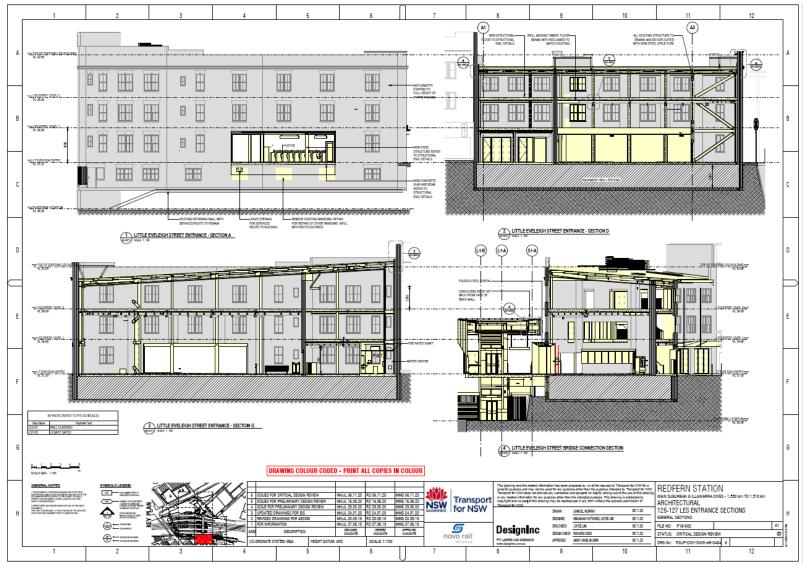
General Sections – Little Eveleigh Street Sections.
